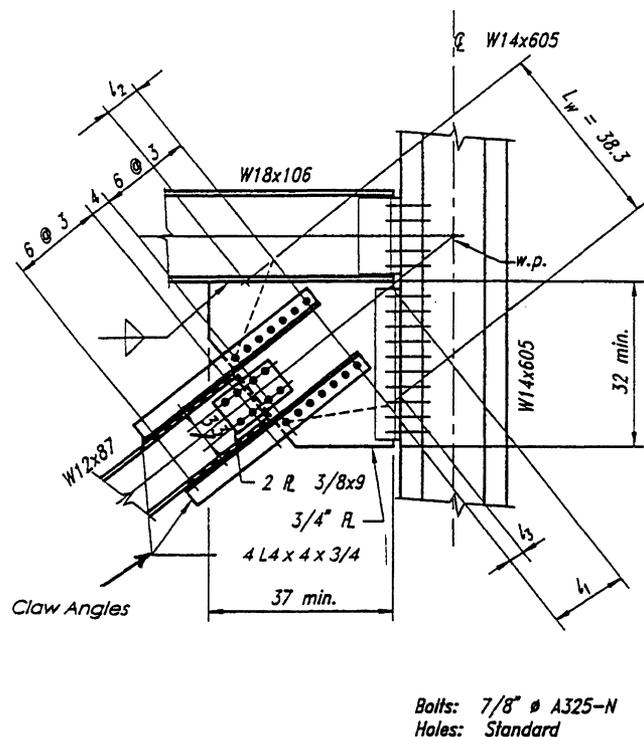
Typical bracing connection with claw angles (from AISC 1992, pg. 7-114).
